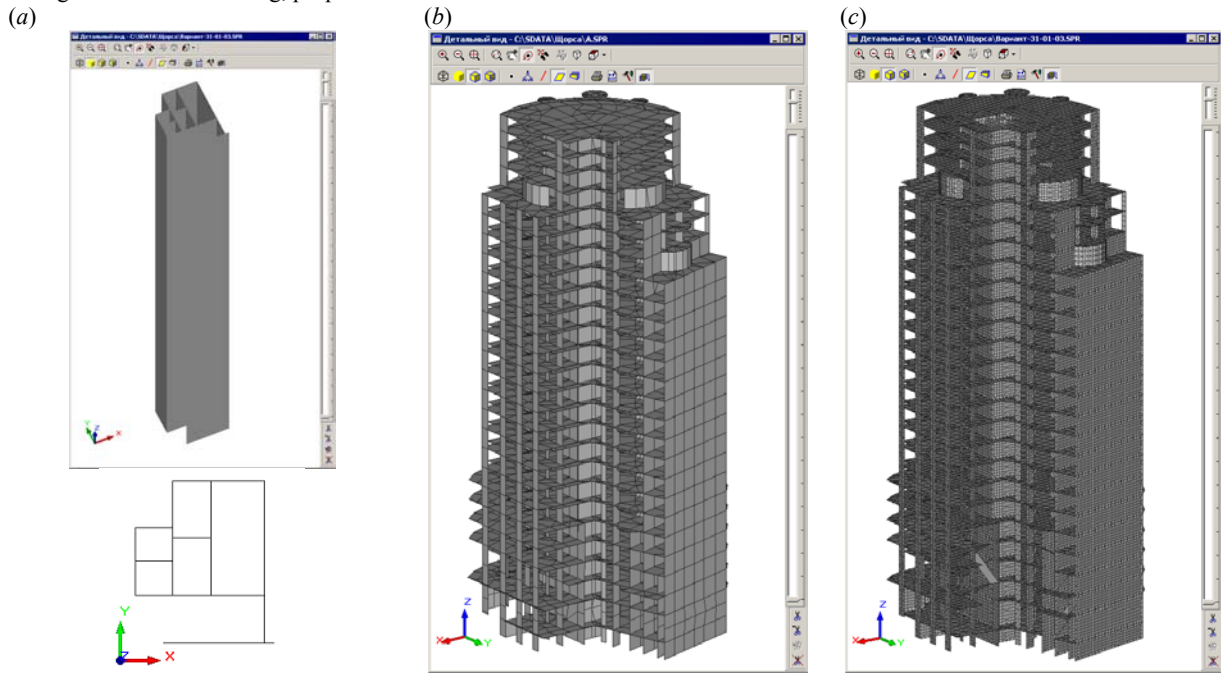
A set of design models: (a) a cantilever model (the structural core's cross-section at the bottom); (b) a geometrically similar model for load gathering; (c) a detailed finite element model for design analyses
